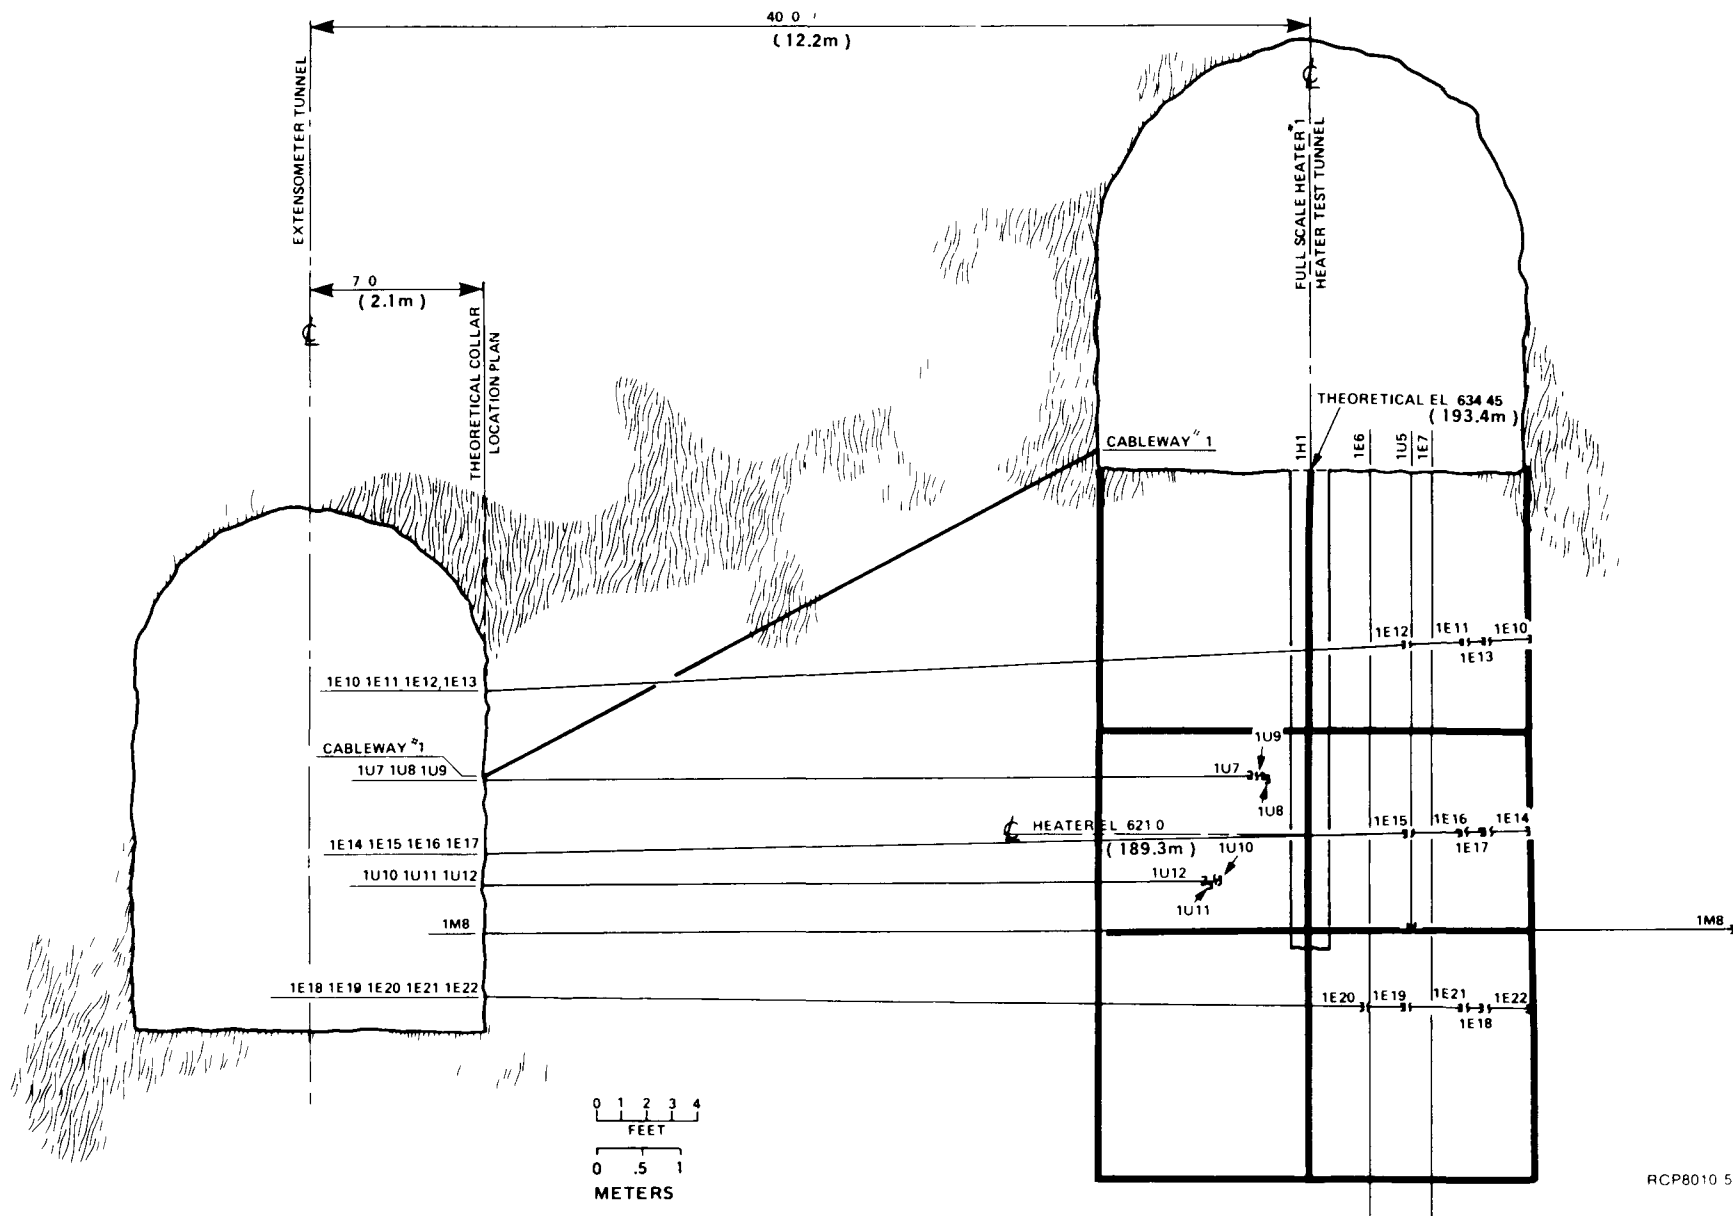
Plan View of Boreholes Drilled for Full-Scale Heater Test #1.
